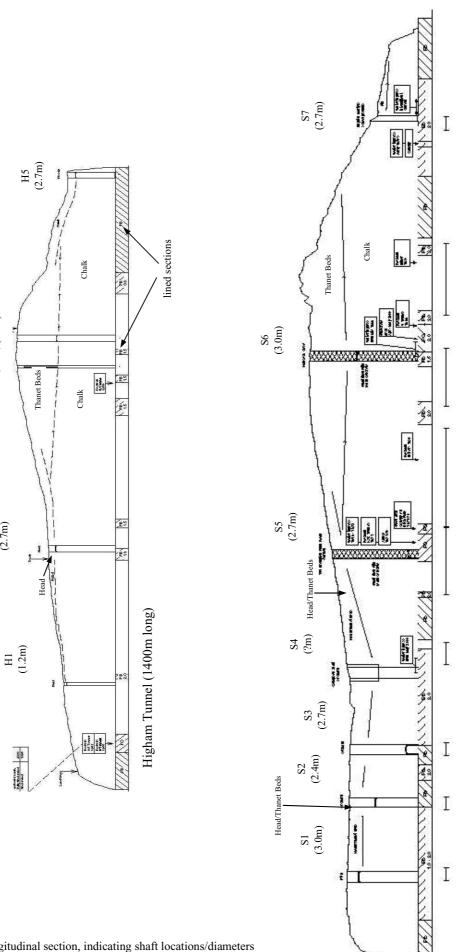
Tunnel longitudinal section, indicating shaft locations/diameters
